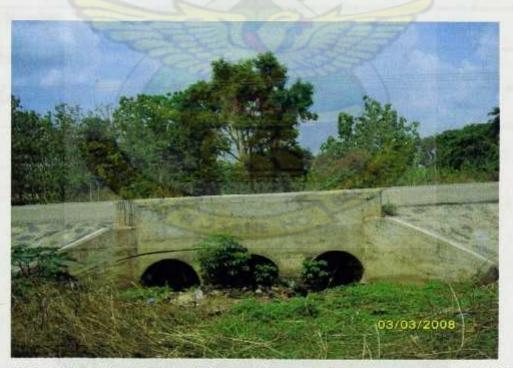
Silted inlet of 3No. 900mm diameter pipe culvert at km 28+125 – 0.5 – 1.0 % slope area (loss of energy as in Figure 4.5)
